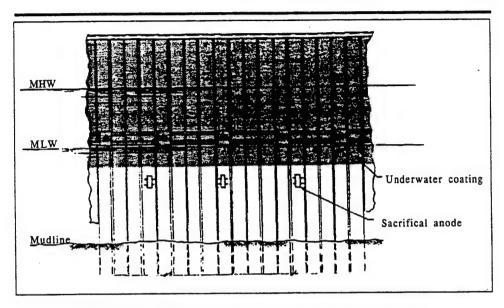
Coating/cathodic protection of steel sheet pile wall.
